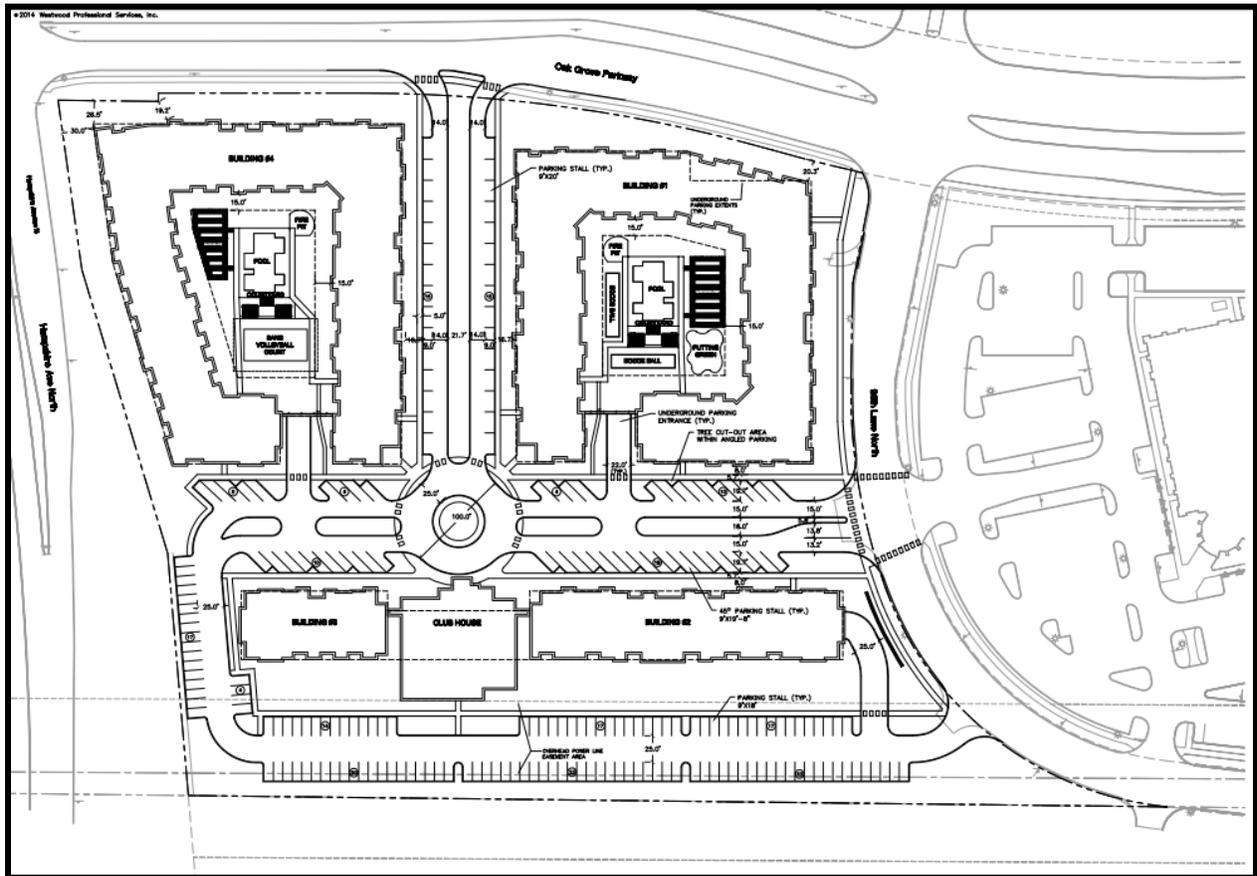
610 West Site Layout (Source: Westwood Professional Services, Inc.)
